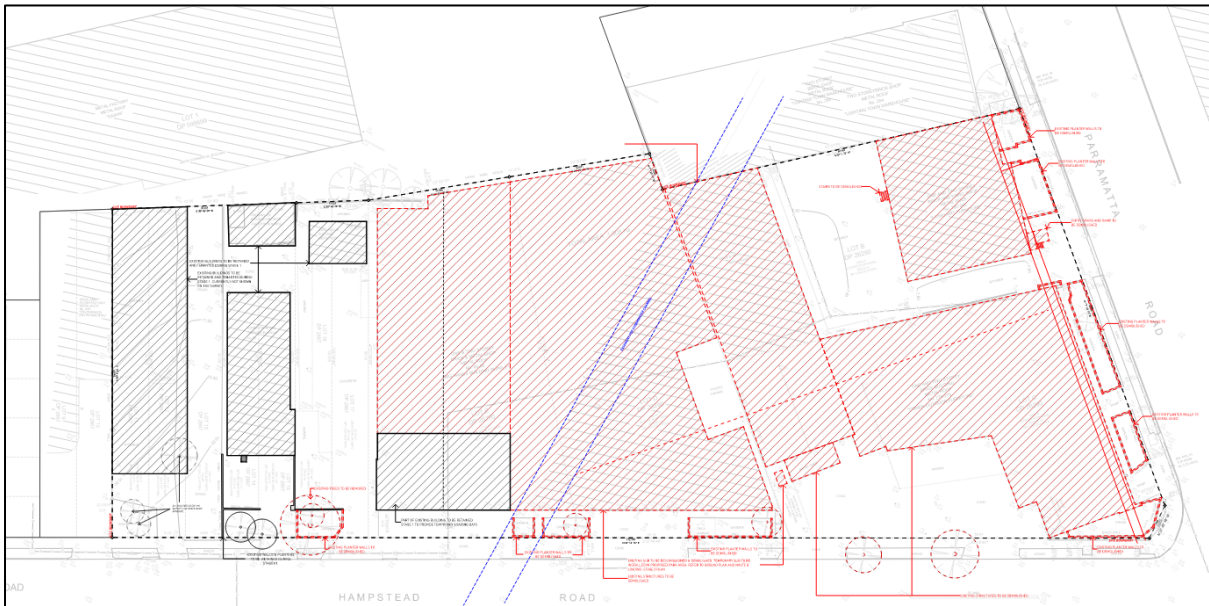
Demolition Plan extract (Source: Smith & Tzannes, 2023)
